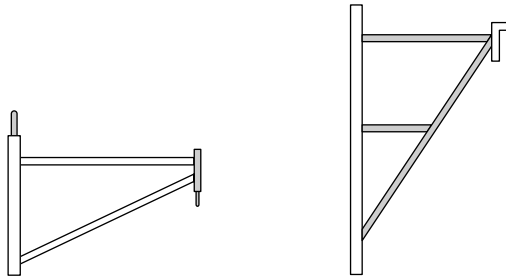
Configuration of Frame for Type 'D' Tower.
